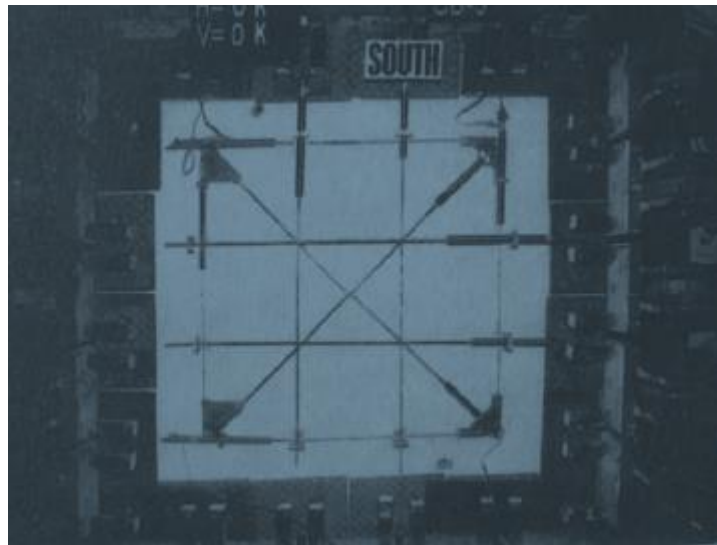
LVDTs arrangement of typical panel in the CB- series. [38]
